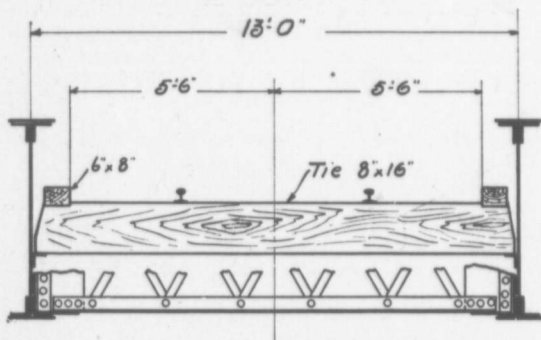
Typical cross section of a Half-through Plate Girder Span.
